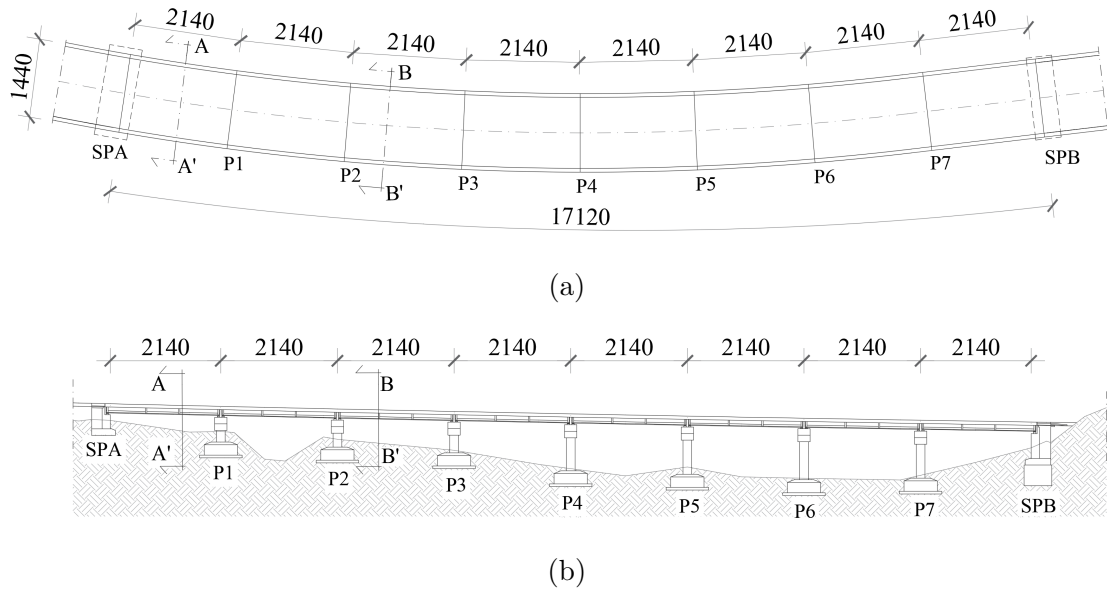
(a) Plan view and (b) elevation of the analyzed bridge
